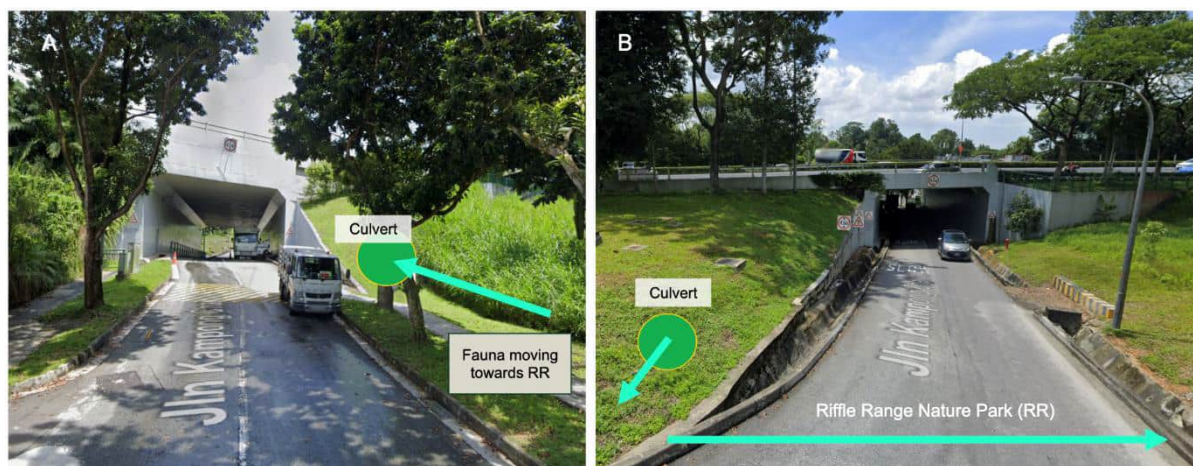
Suggested culvert location along Jalan Kampung Chantek
